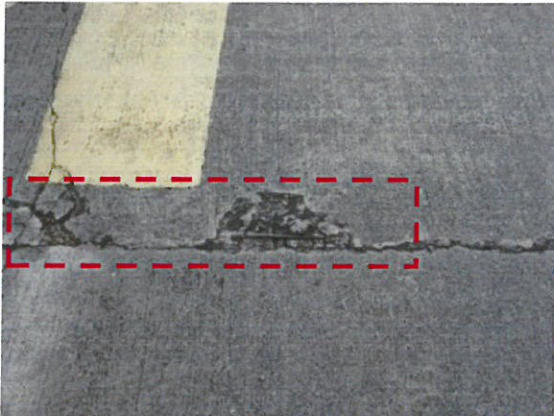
Concrete spalls and delaminations on top surface of roof slab
